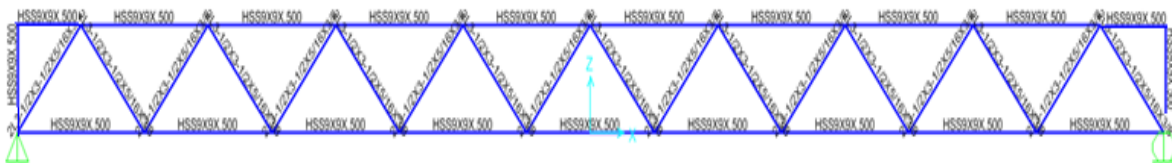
A SAP 2000 illustration of the steel truss and its selected steel members.
